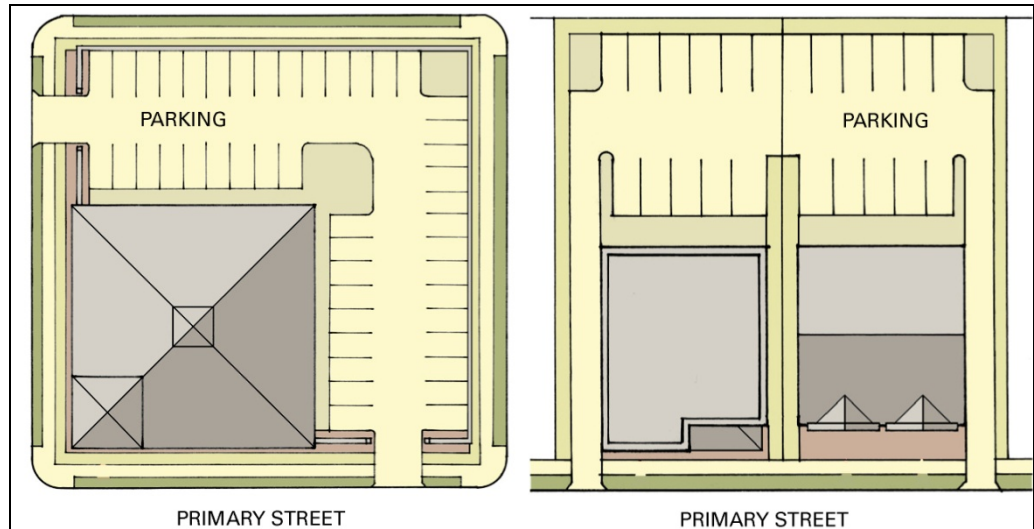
Buildings in infill areas should not have frontages that are dominated by off-street parking areas. These images demonstrate two acceptable options.
